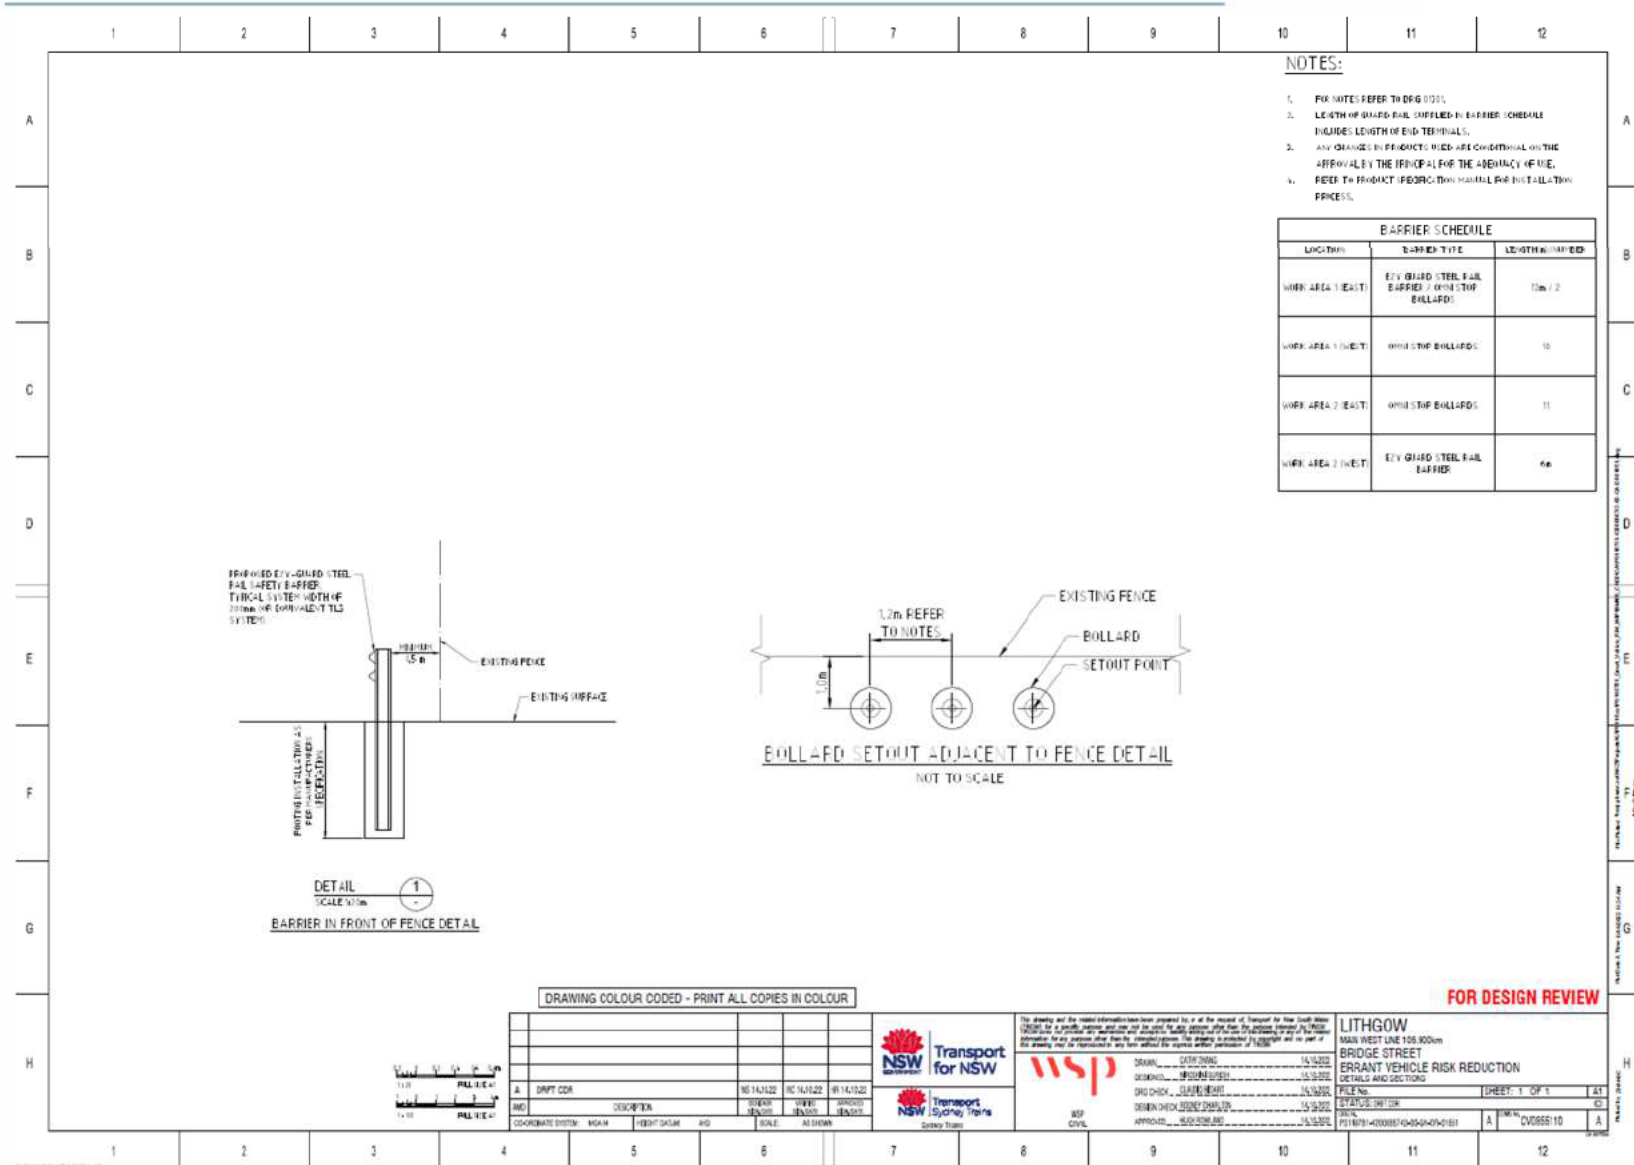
Bridge Street Errant Vehicles Risk Reduction - Barrier and Bollard Details and Sections (Source: WSP 14/10/2022)
